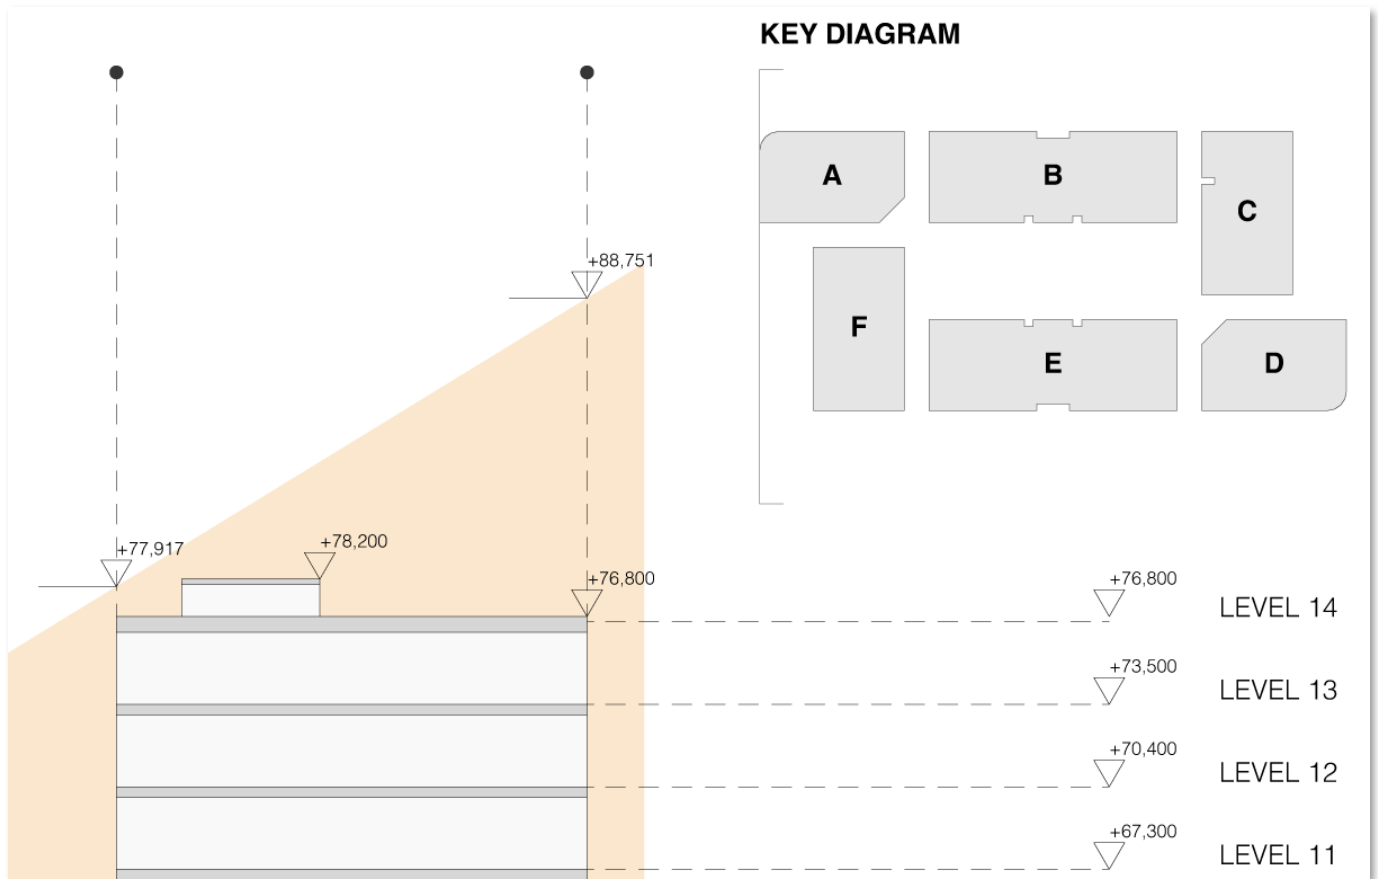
Tallest building envelope (D) & Top of Solar Plane
